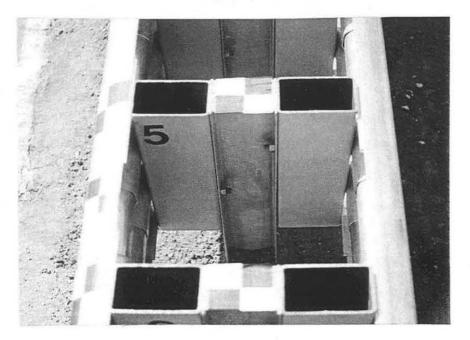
Approach Guardrail Transition - Median Application, Design No. 1
